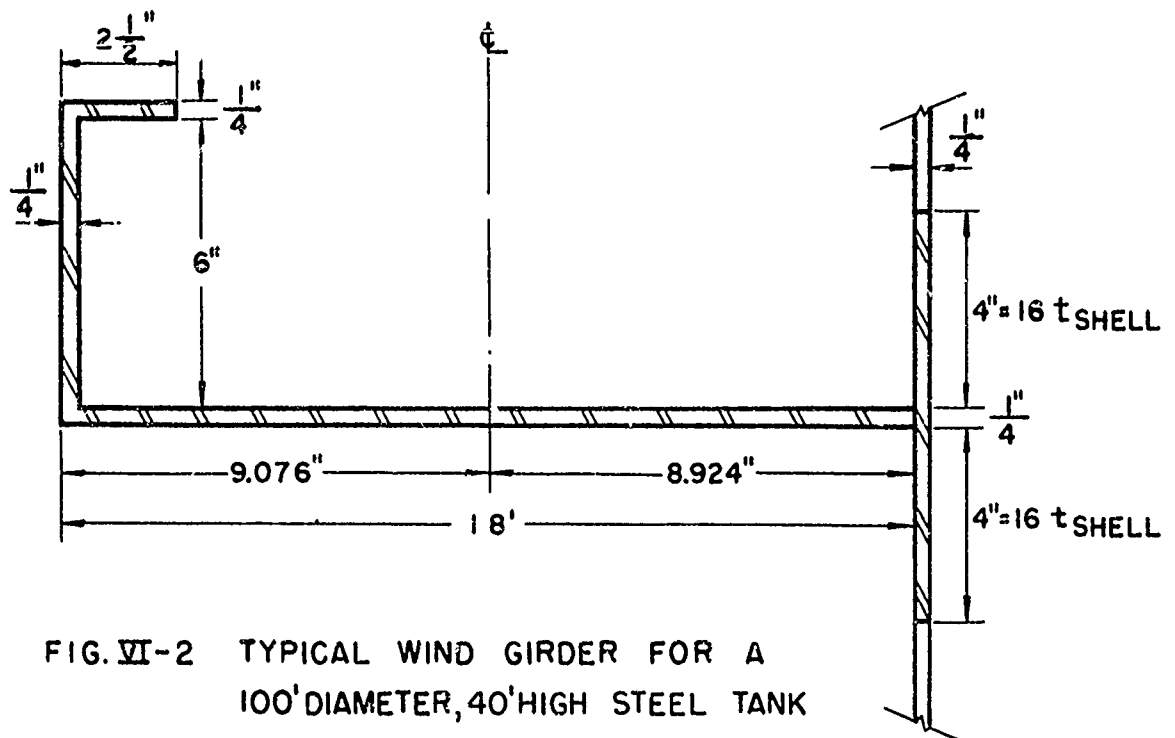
TYPICAL WIND GIRDER FOR A
